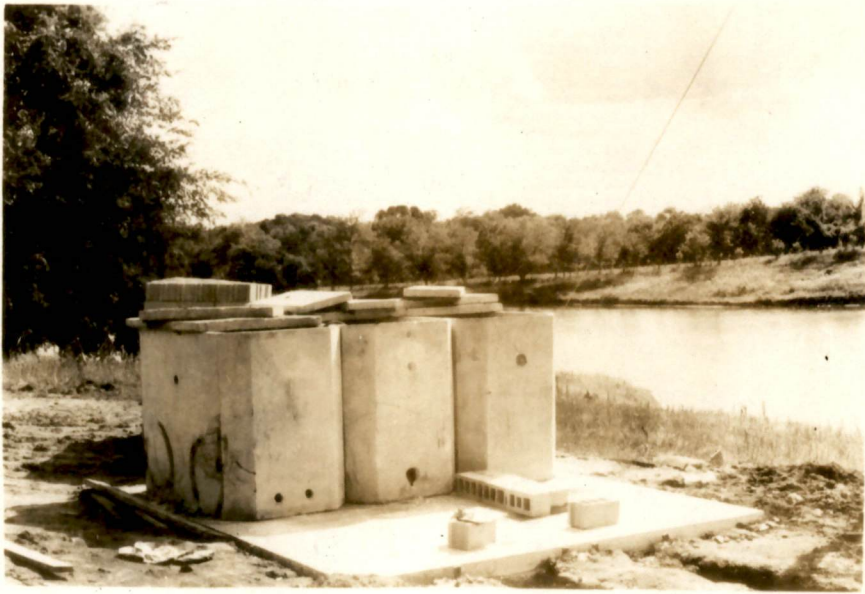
Foundation and Precast Septic Tanks Set in Position Prior to Construction of Building.
